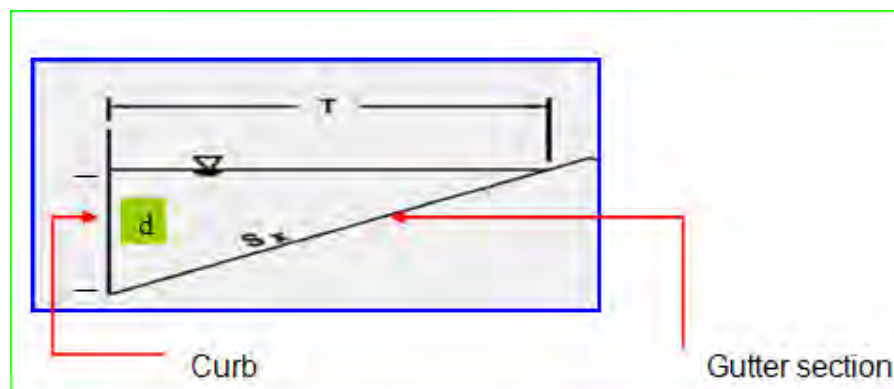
Curb-gutter section showing spread distance and pavement cross slope  $S_x$
